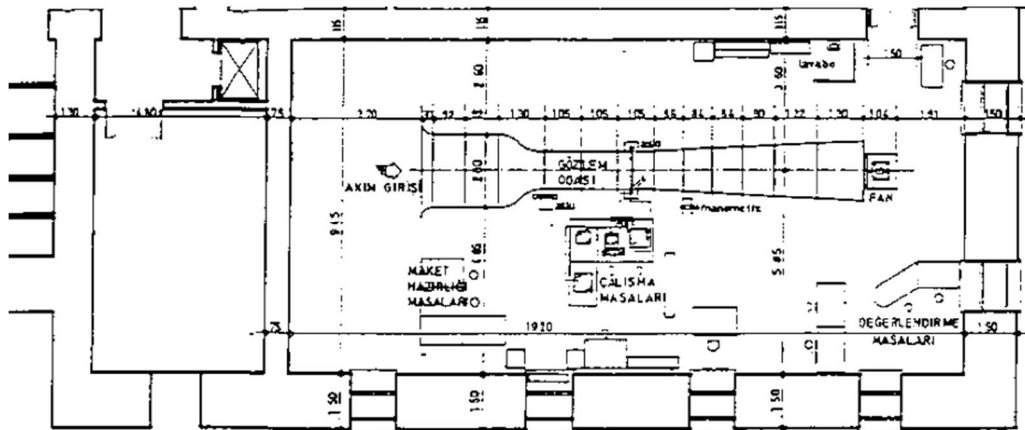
I.T.U. Arch. Fac. Phy. Env. Cont. Lab. wind tunnel unit layout in plan.
